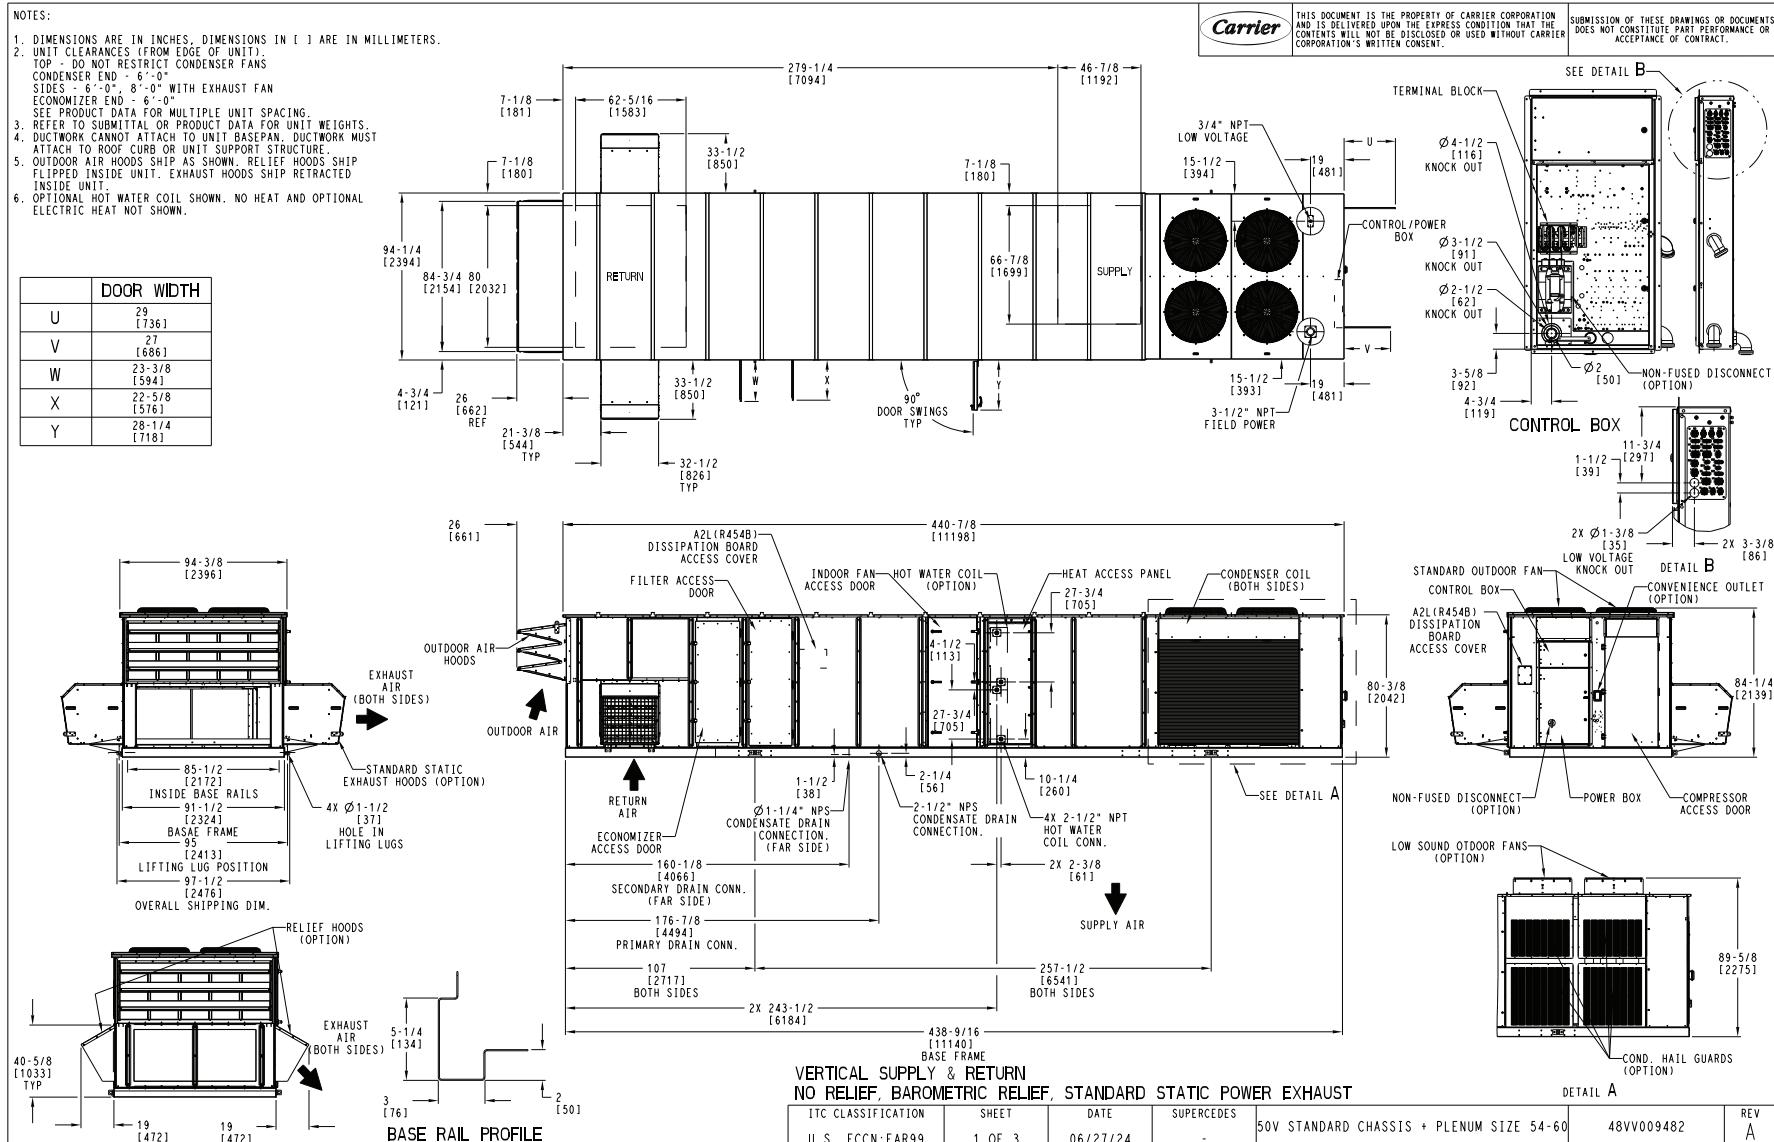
50V 55-60 Ton Standard Chassis with Plenum Section
